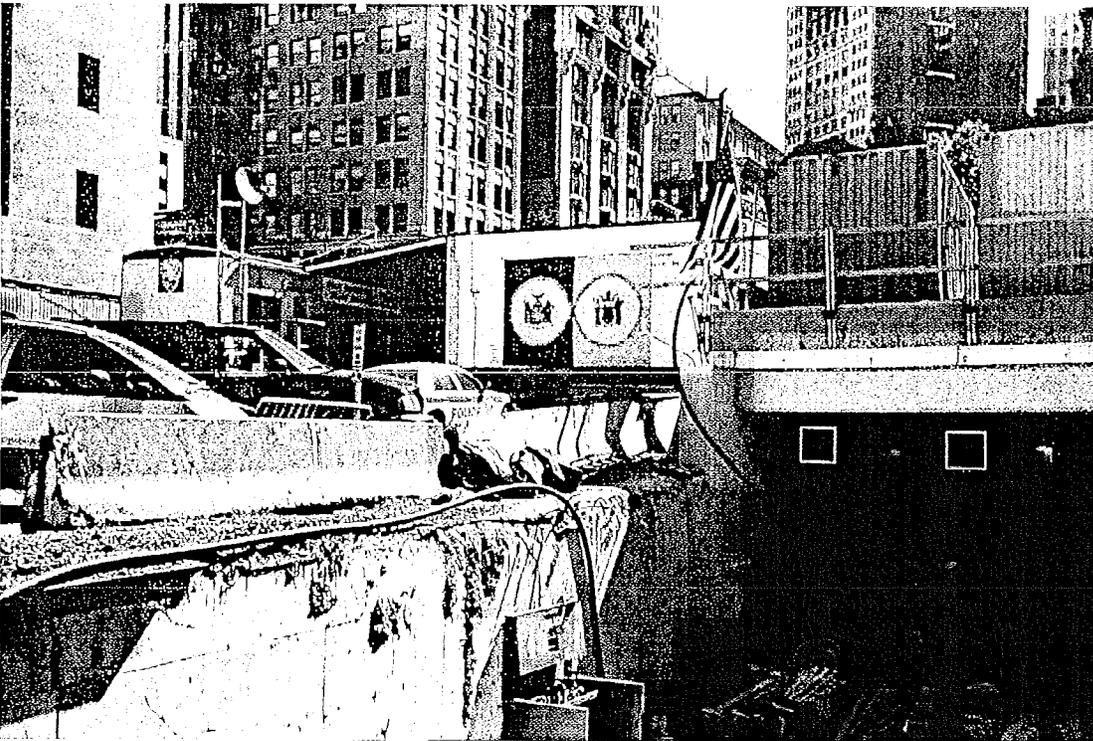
Covered I.R.T. subway line along Greenwich Street, dividing east and west halves of APE, looking south. Liberty Street in far background.
